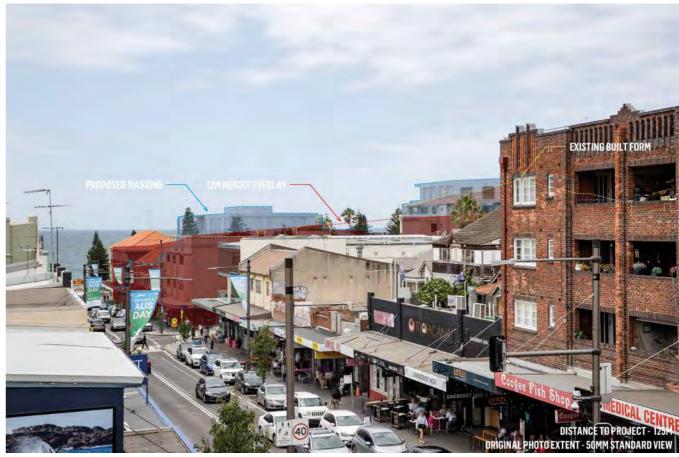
Existing view north-east from unit 1 balcony - level 2 - 180. Coogee Bay Road
